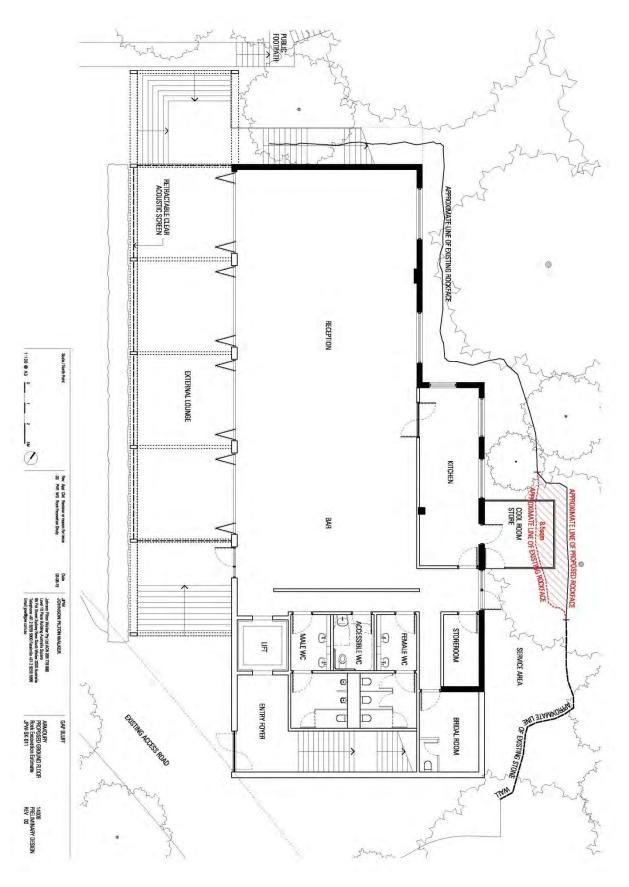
Proposed ground floor plan for the Armoury. (Source: JPW 2015)
